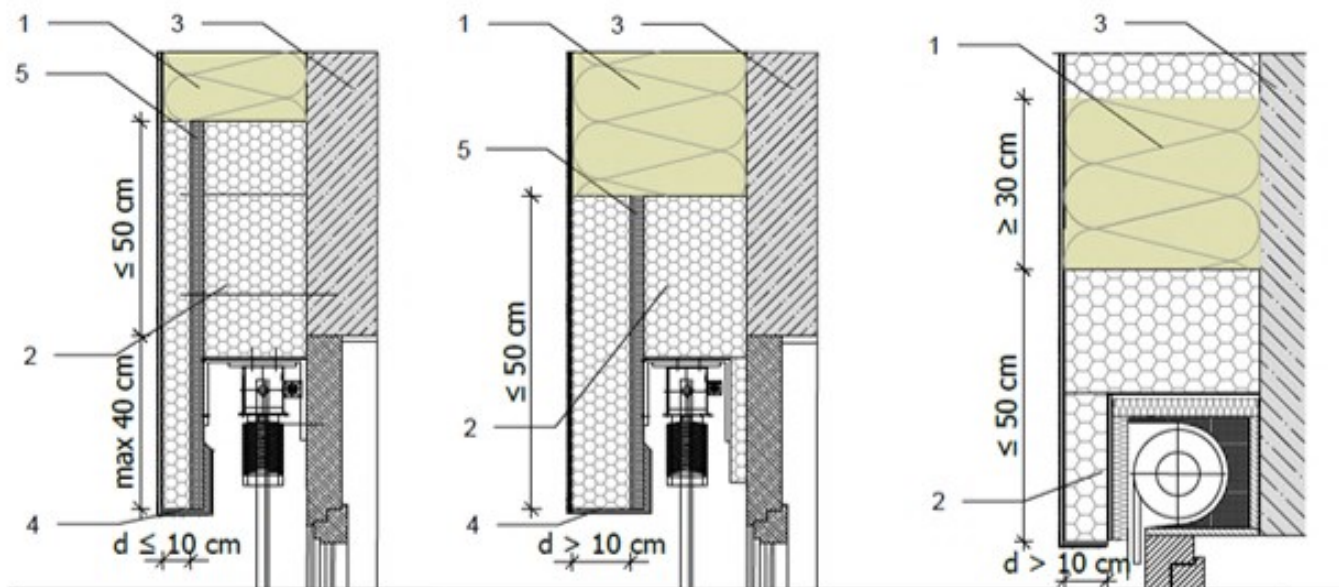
Execution details of fire barrier round the façade opening with a window blinds box on the external wall [29]
